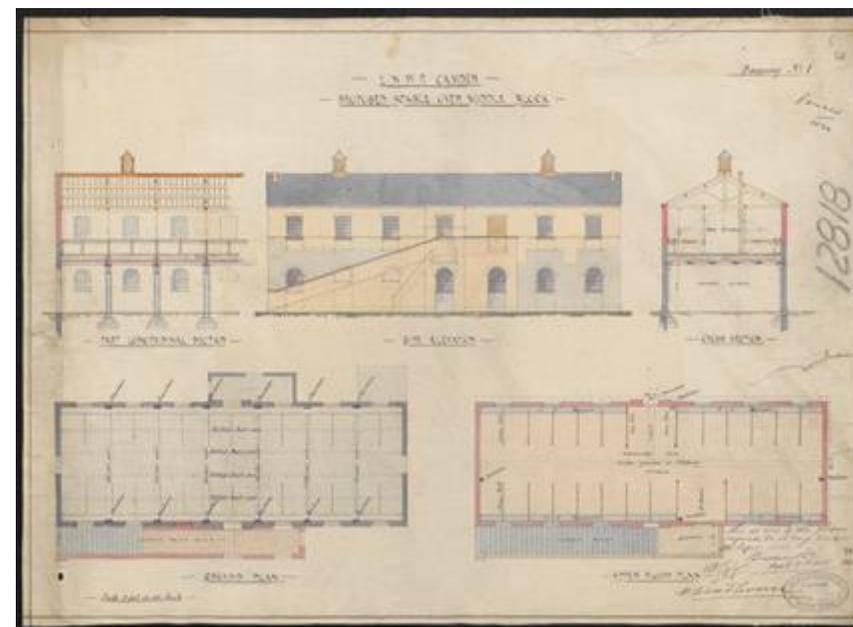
Drawing dated 20th September 1881 showing first floor extension to Long Stable.
